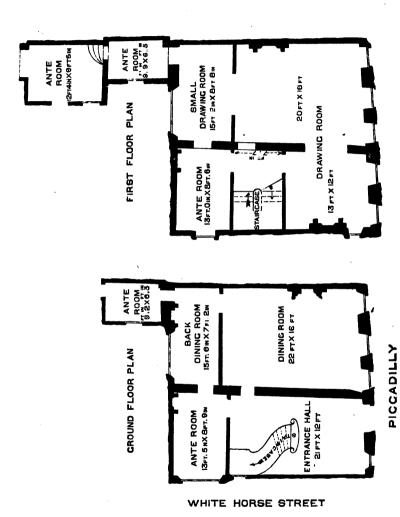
FIG. I.—GROUND PLAN OF NO. 95, PICCADILLY.
